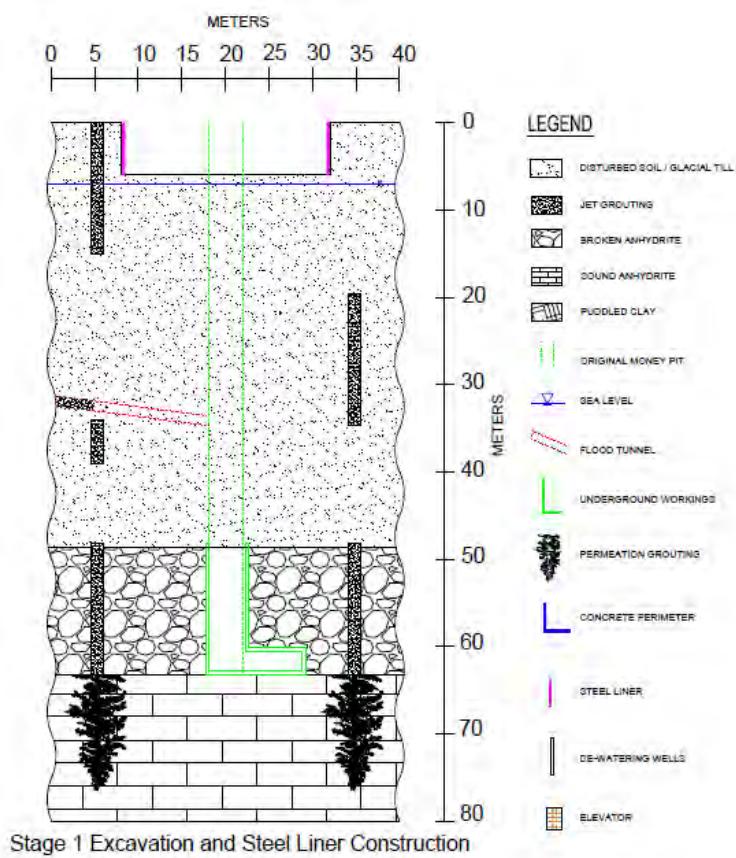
Cross-section of the Stage 1 deep excavation and steel shaft liner construction
